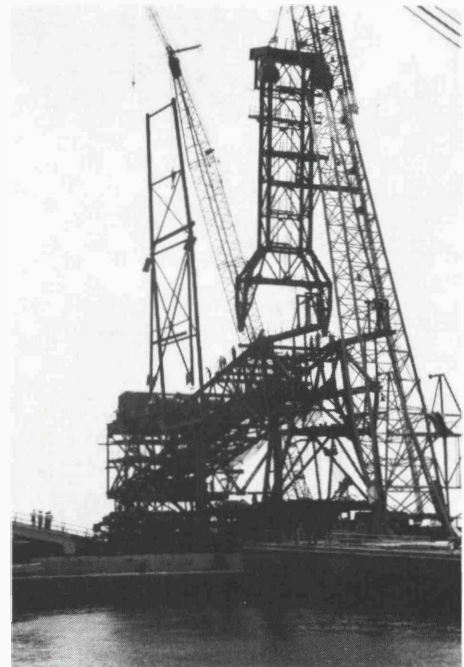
Mast assembly suspended from Sun 800 barge mounted crane
